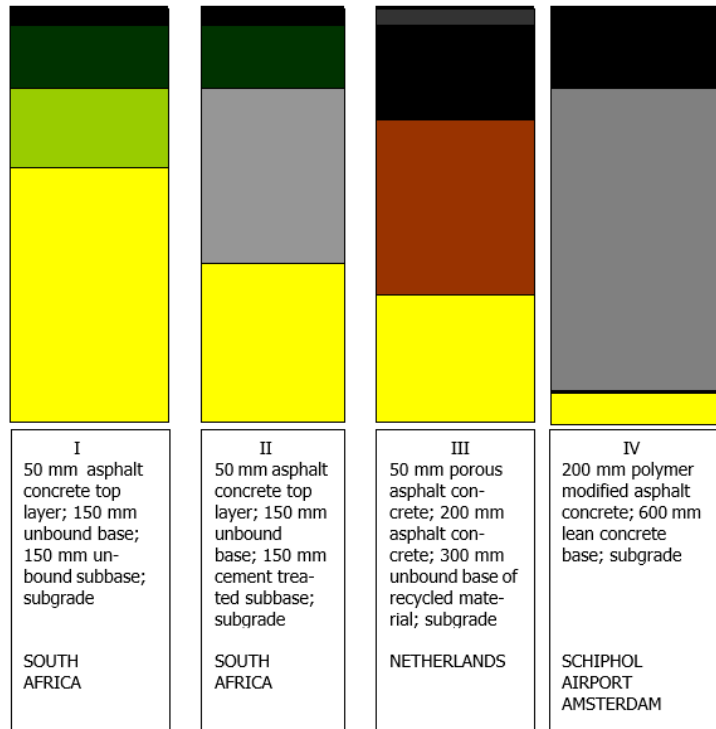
Different types of flexible pavement structures (Cross-sections I through IV).
